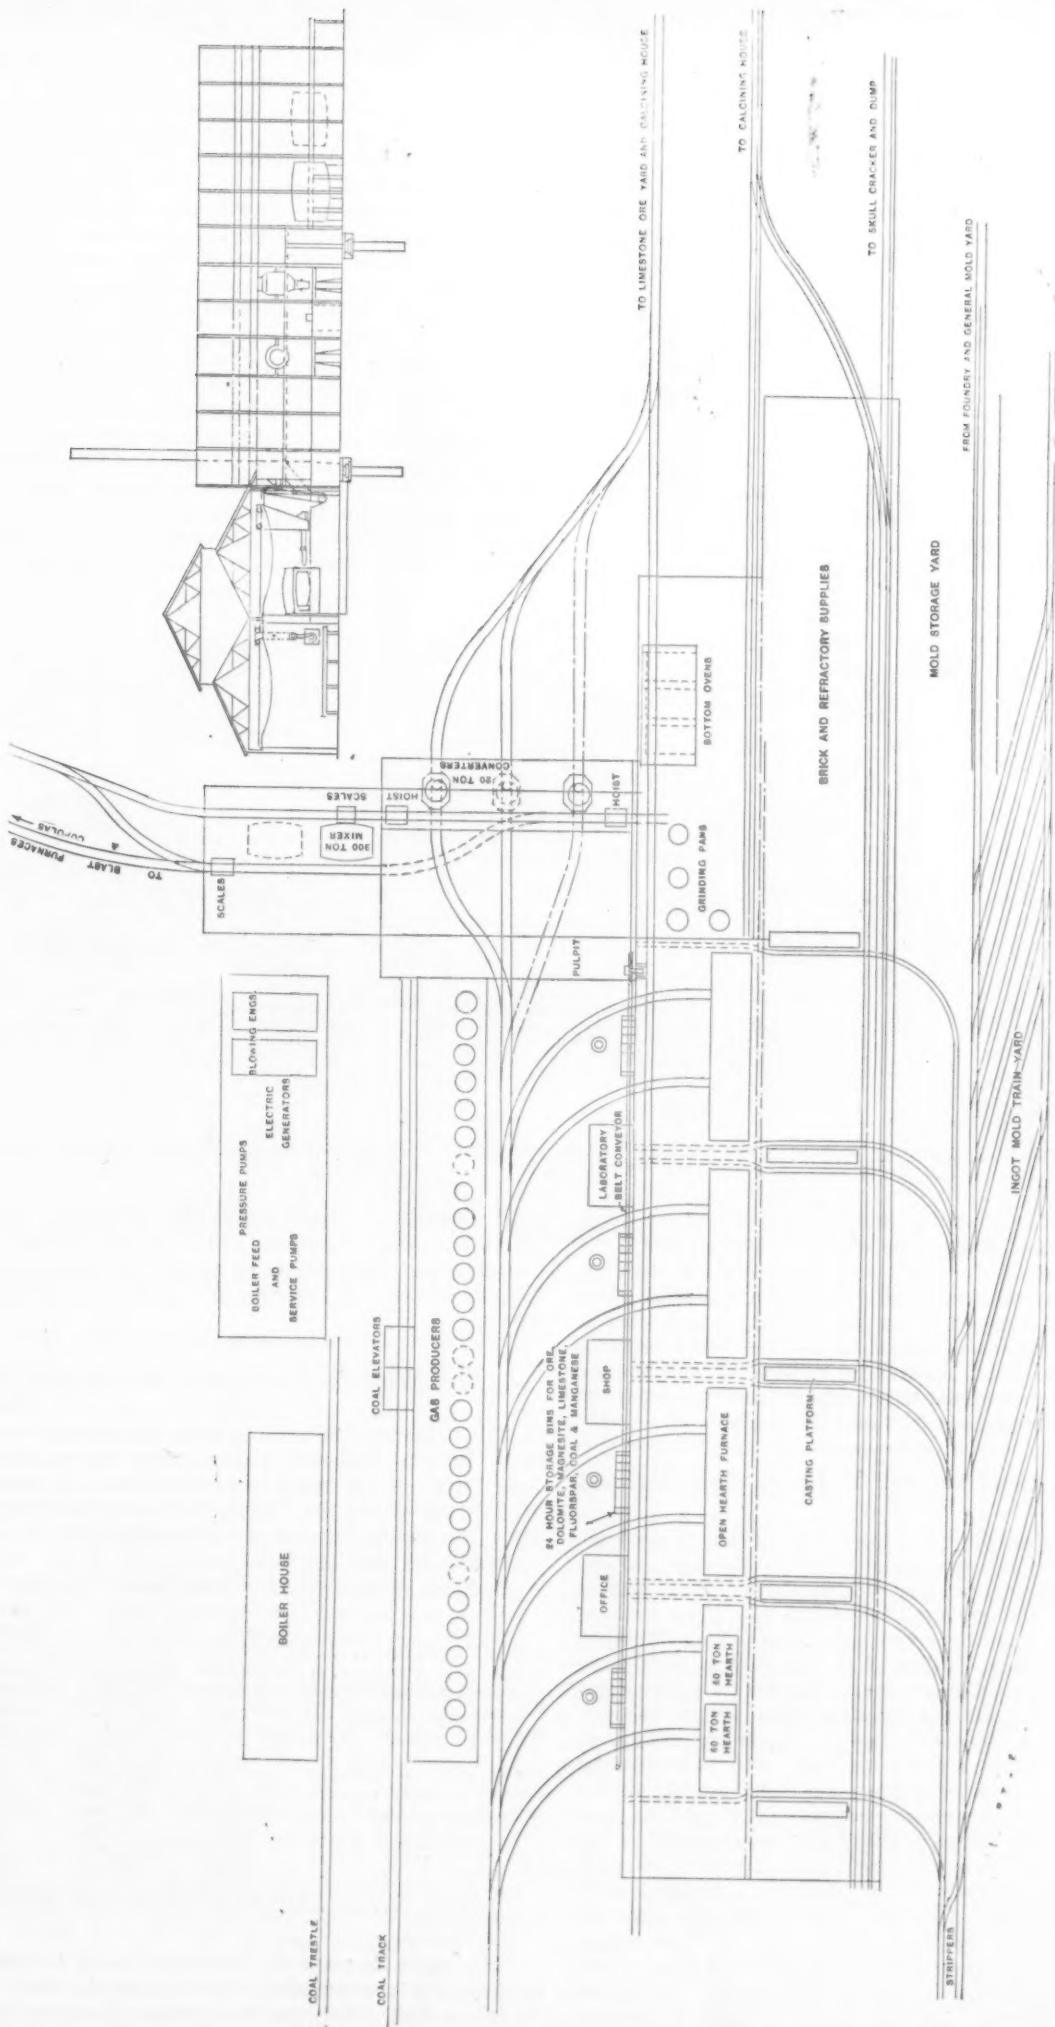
Proposed Plan for Duplex Steel Works, Arranged so as to Secure Independent Operation of Each Open Hearth Unit.
